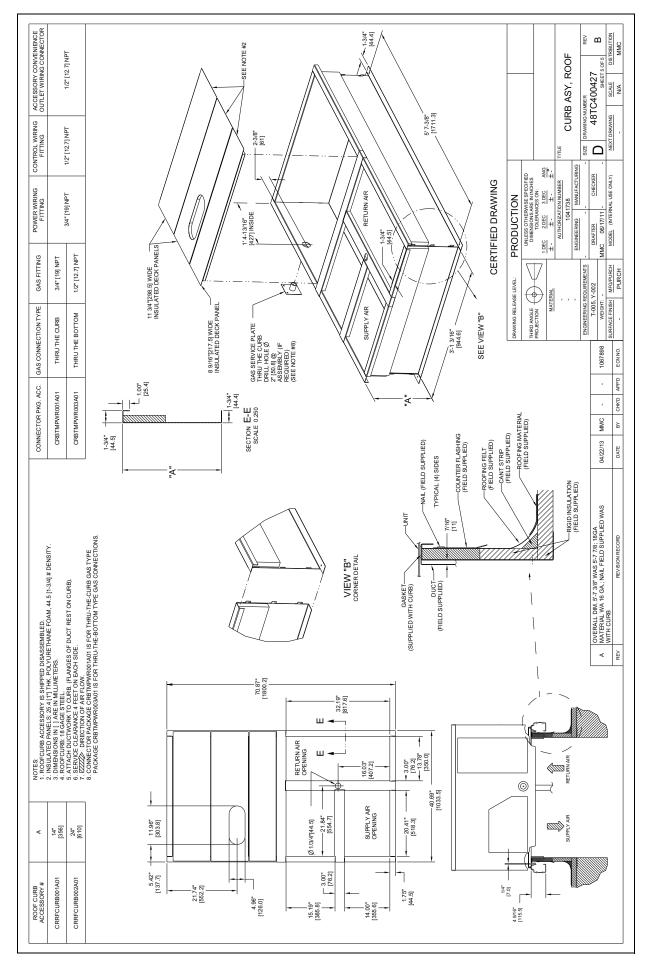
50FC\*\*04-07 Roof Curb Accessory Details
